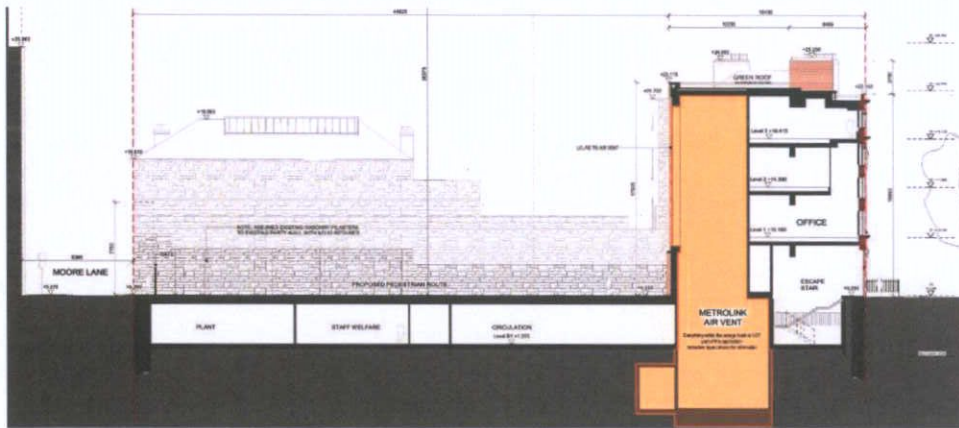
Section, facing towards north boundary wall between Nos.42 and 43 O'Connell Street Upper Underpinning – lining
